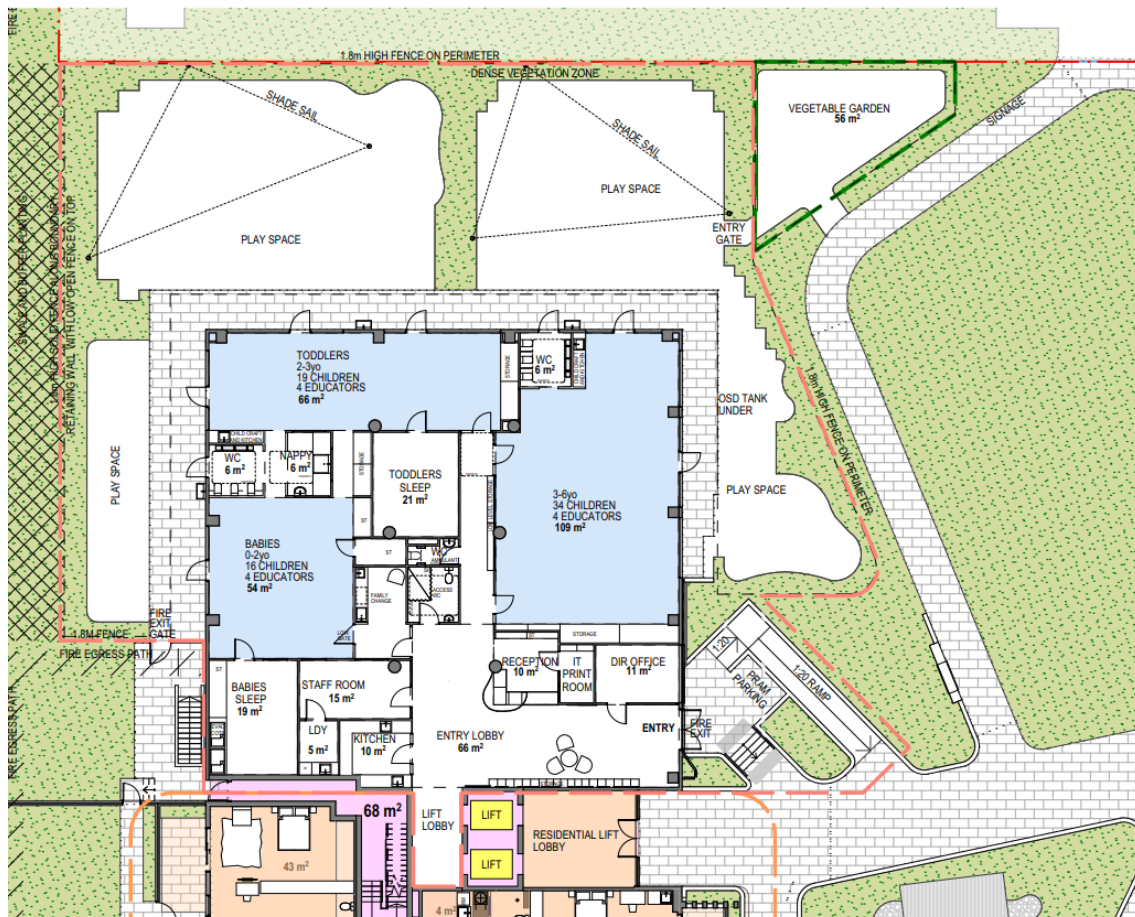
Proposed works and ground floor layout (Source: Architectural Plans, PA Studio)
